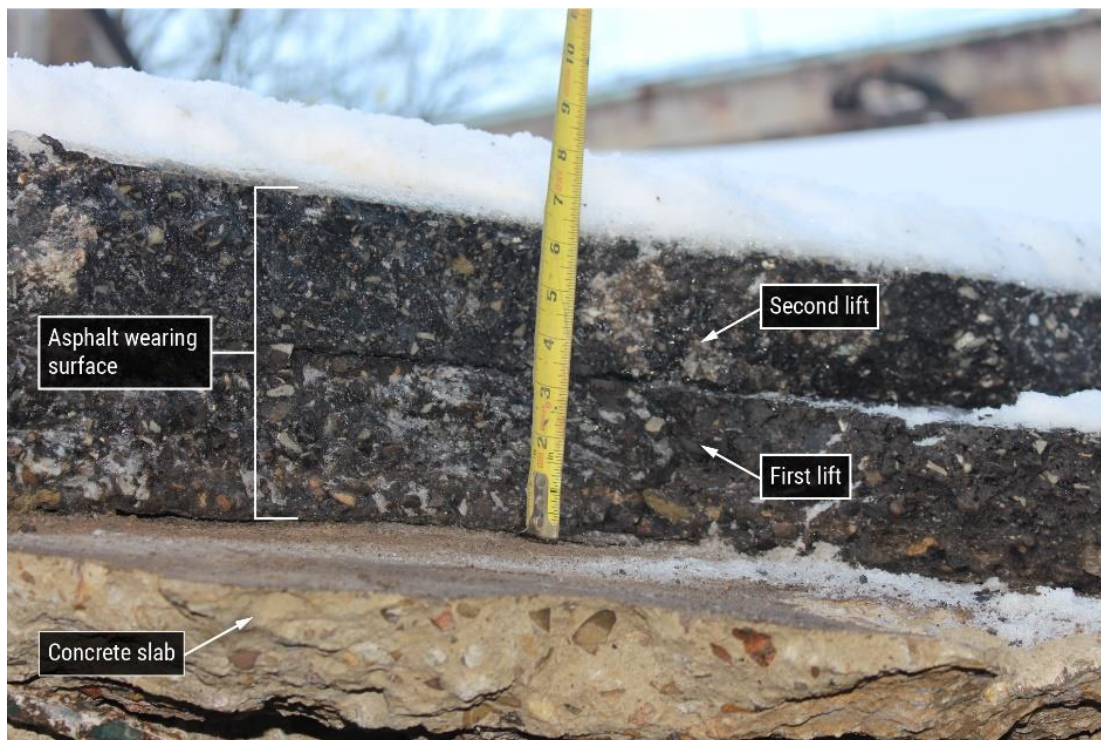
Photograph showing asphalt wearing surface atop reinforced concrete bridge deck in the left eastbound lane near the southwest leg.
